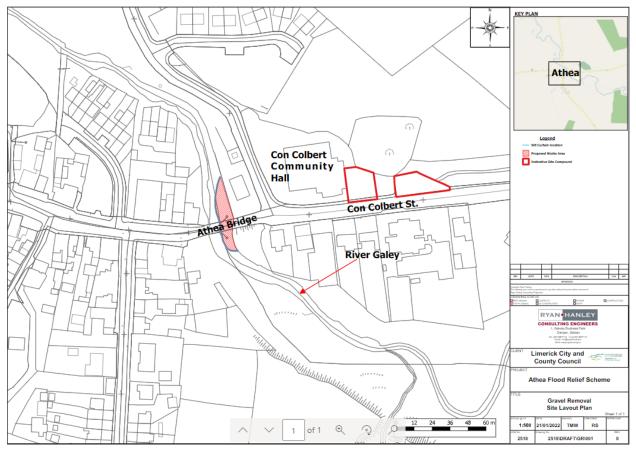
Proposed works area for gravel removal works at Athea bridge
